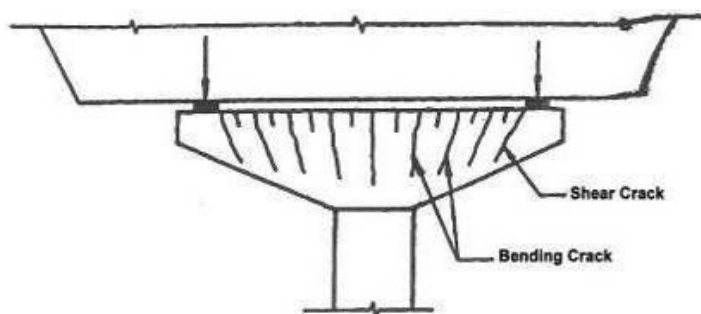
Nature of Structural Cracks in a Long Cantilever Hammer head Pier Cap
